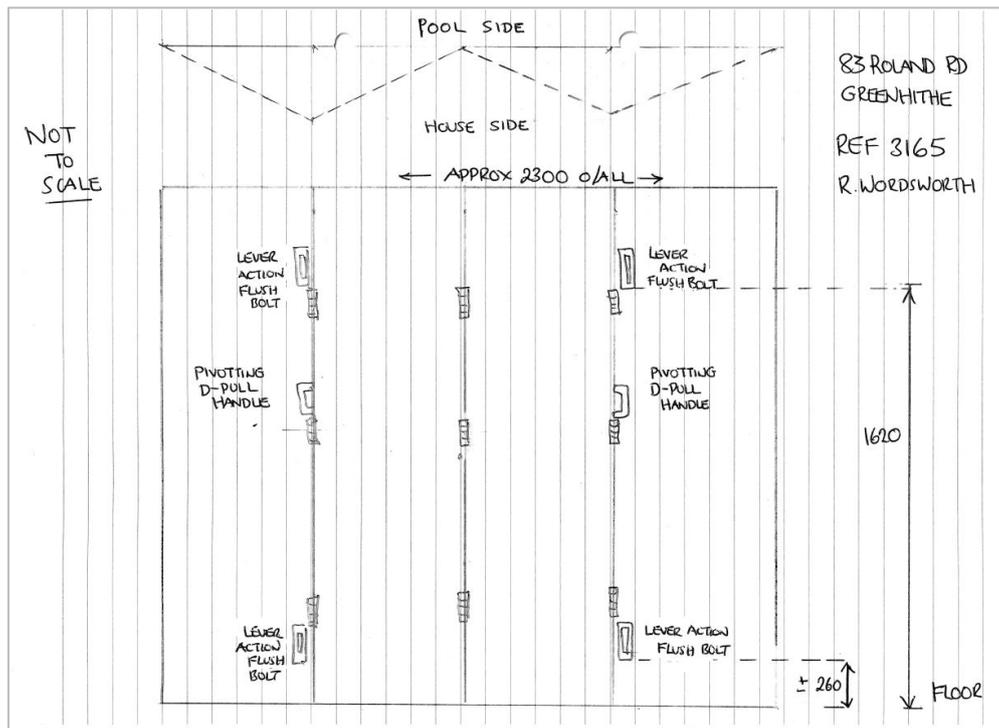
The internal bi-fold door⁹ (sketch by applicant, not to scale)
